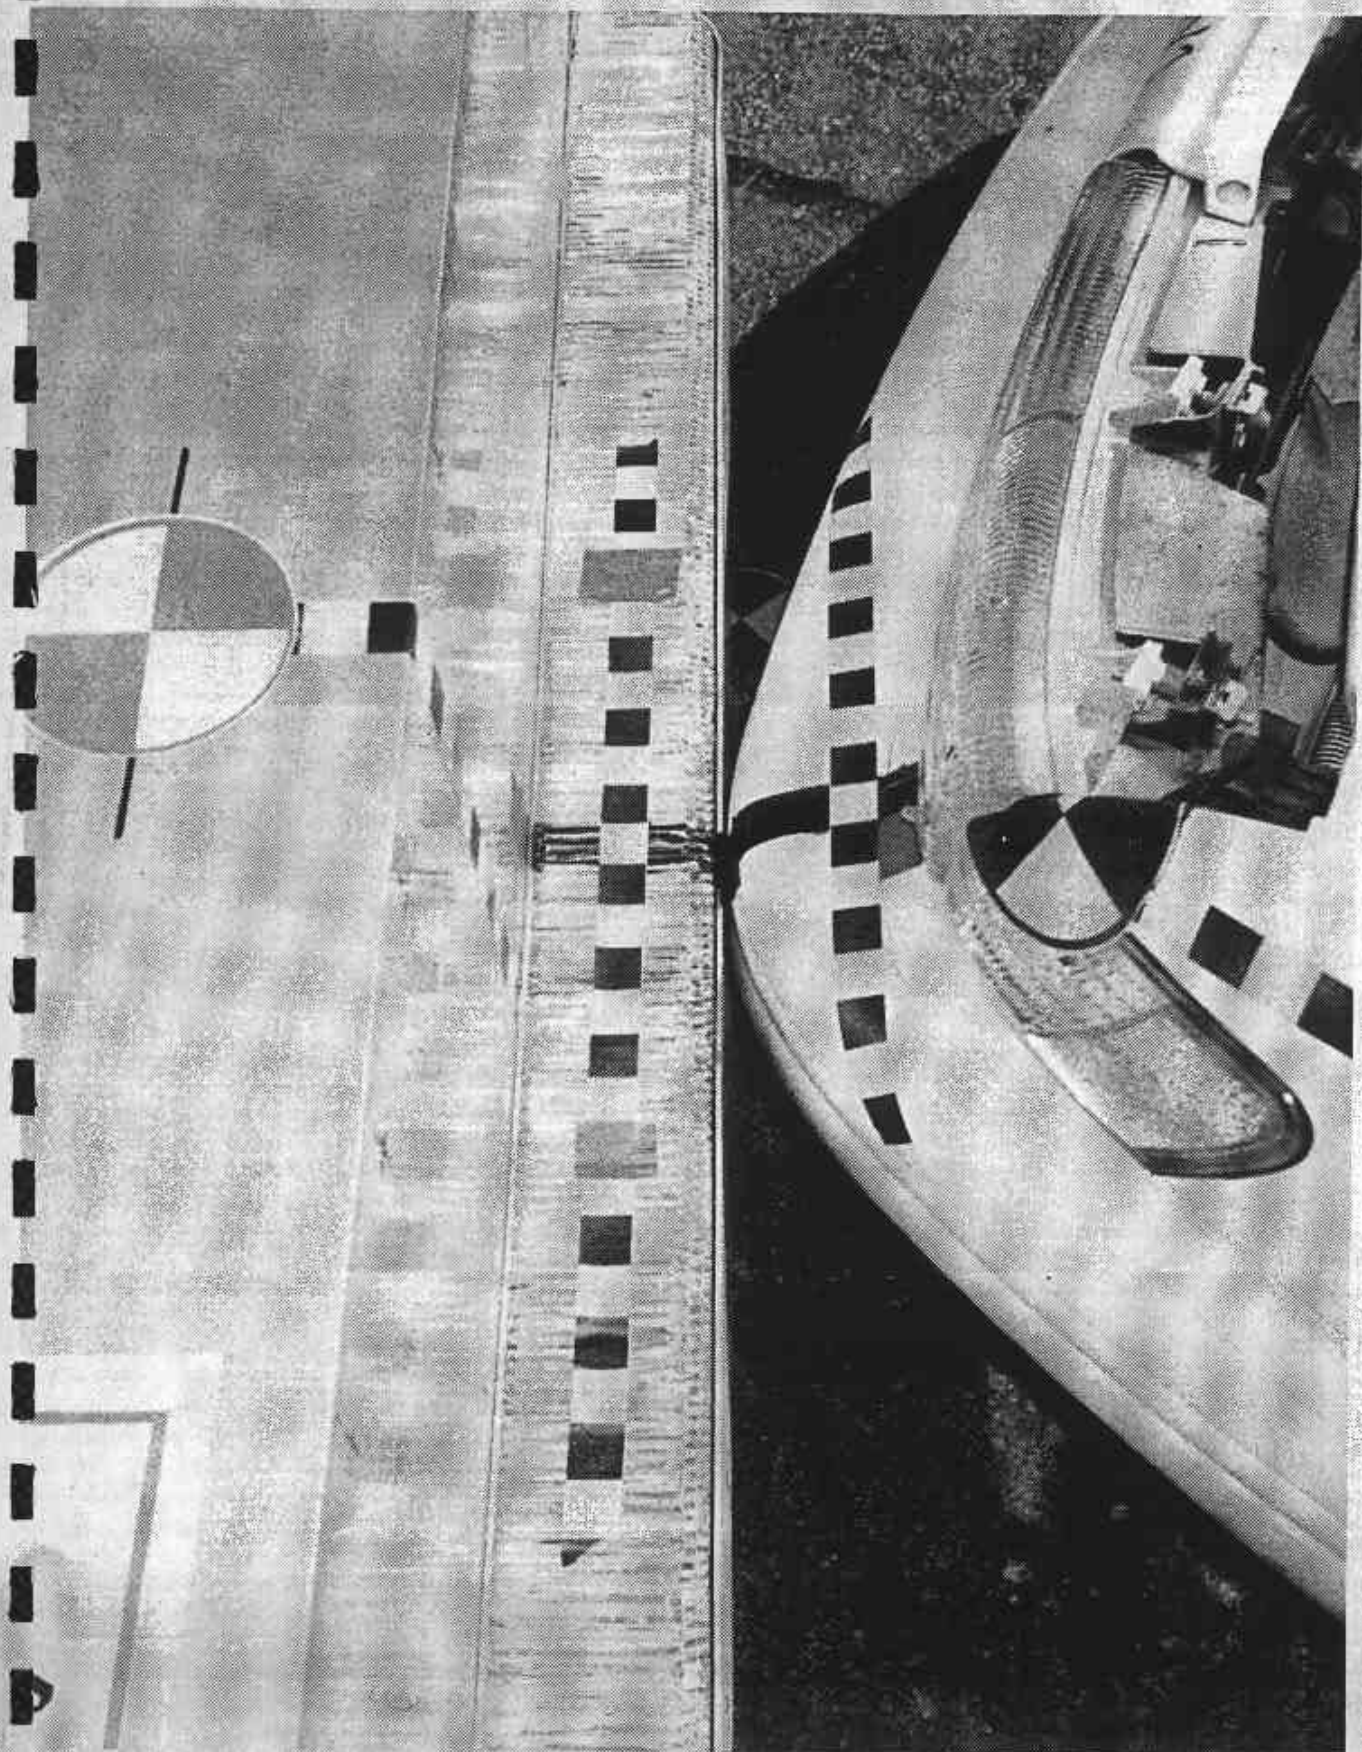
PRE-TEST CLOSEUP VIEW OF IMPACT POINT
